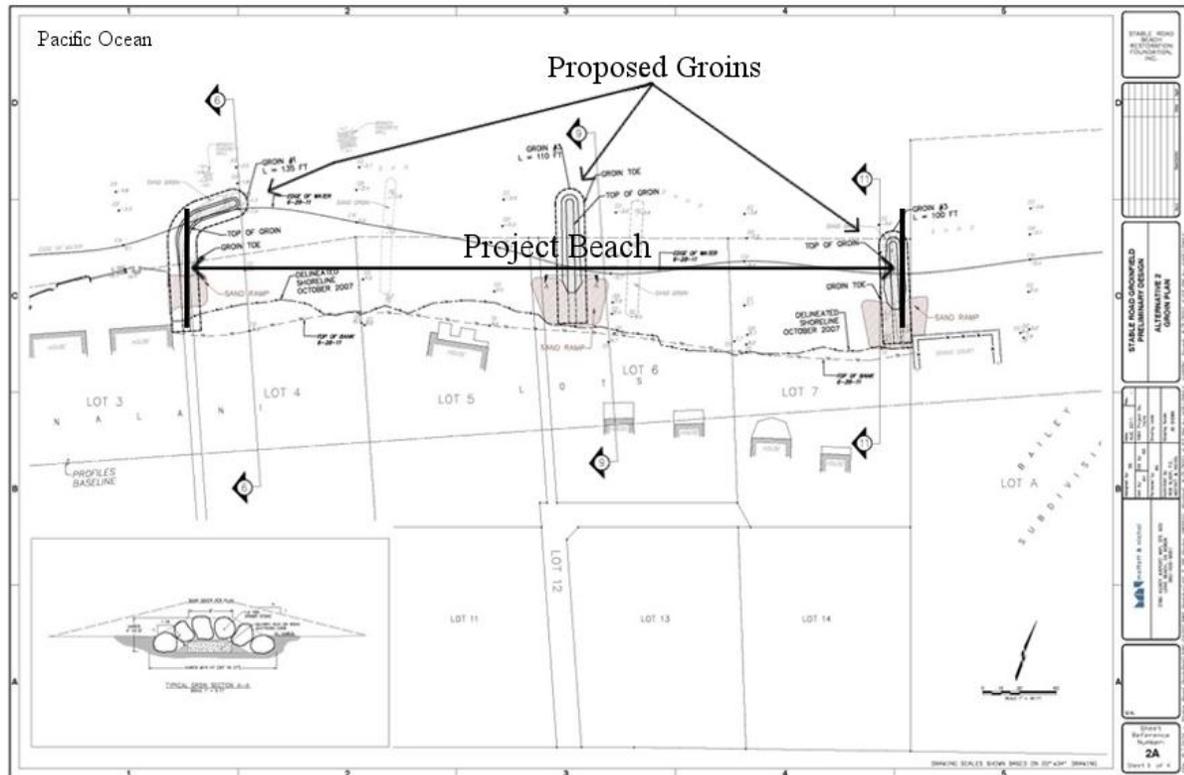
Proposed Action Site Plan and Replacement Groin Cross Section – 3 Groin Plan
